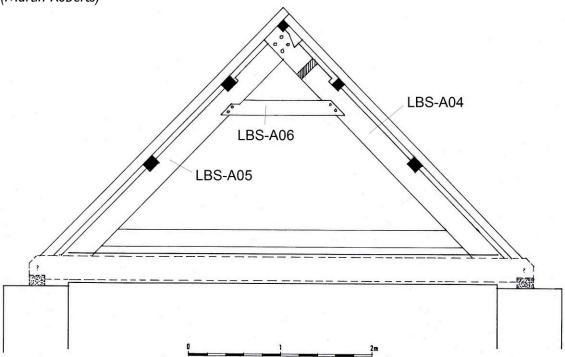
West range; truss 2 (east face), showing the location of samples LBS-A04-06 (Martin Roberts)
